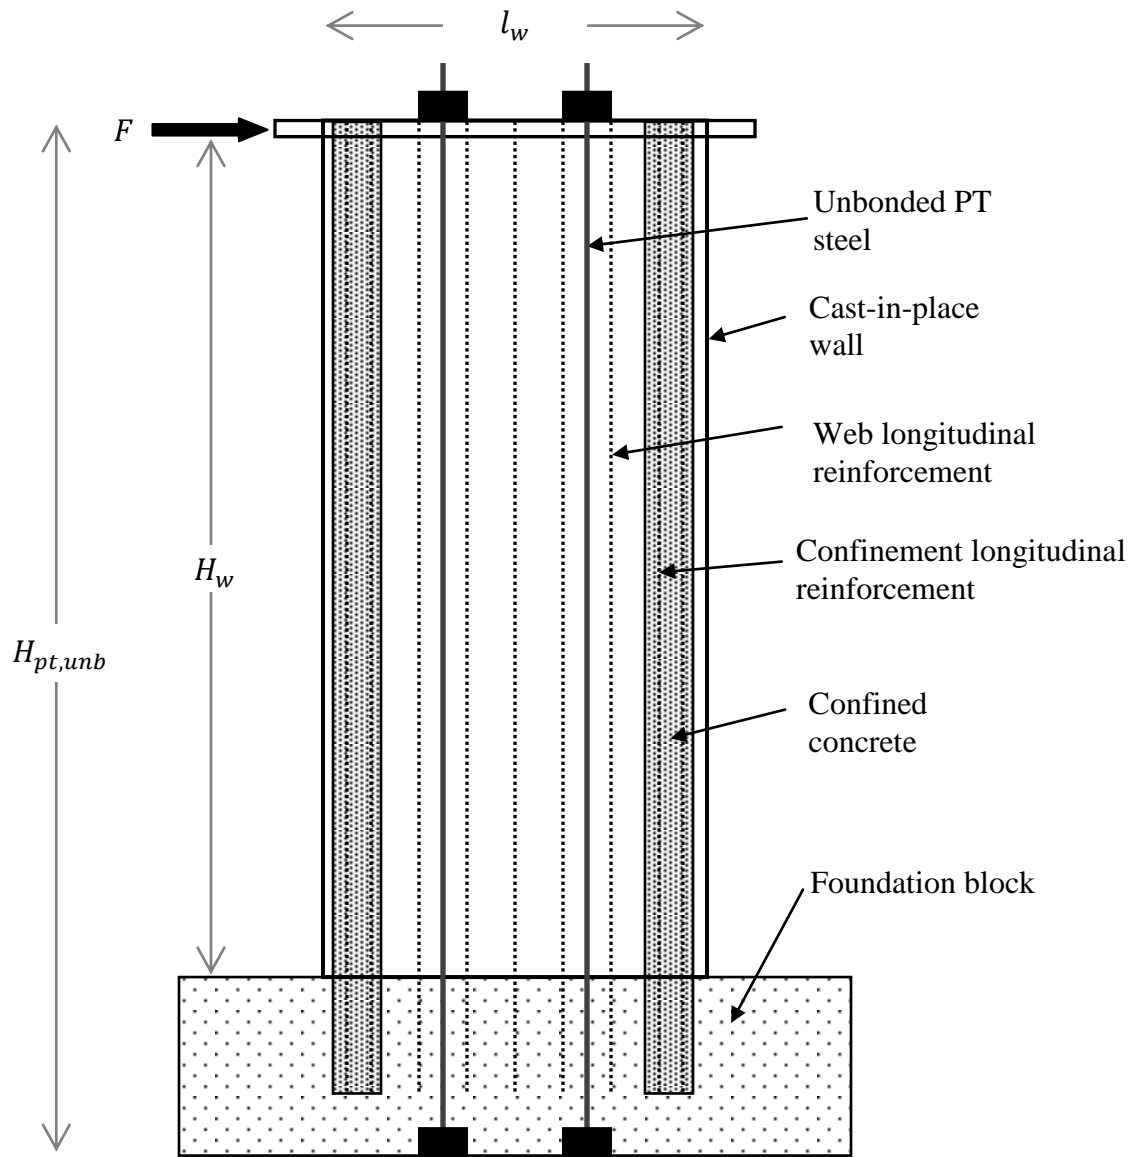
(b): Section of Cast-in-place wall with unbonded PT steel and longitudinal reinforcement and applied lateral load
